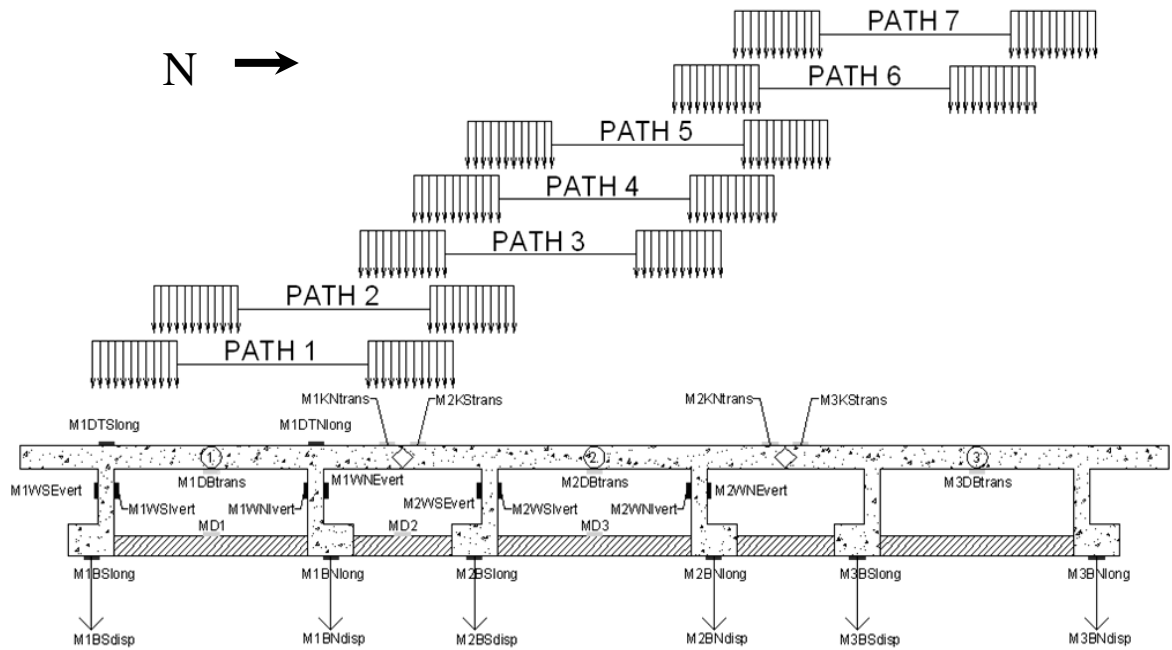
Schematic Layout of 2008 Transducers and Loading Paths at Midspan
